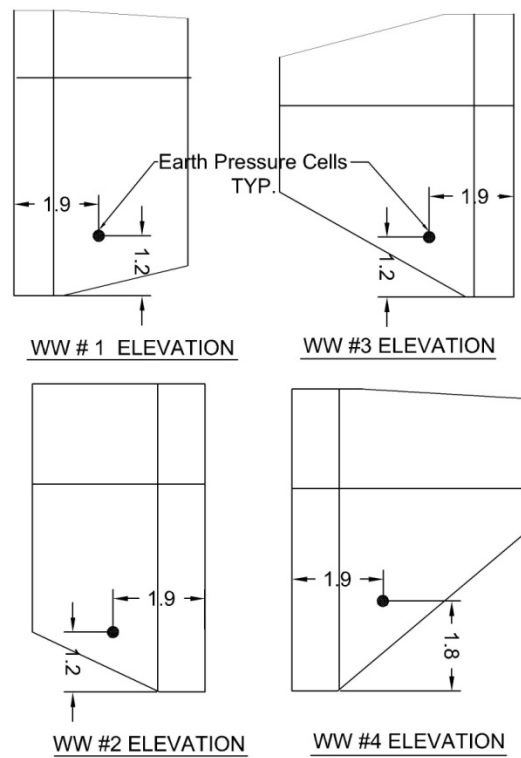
Wingwall Earth Pressure Cells at the Stockbridge Bridge
